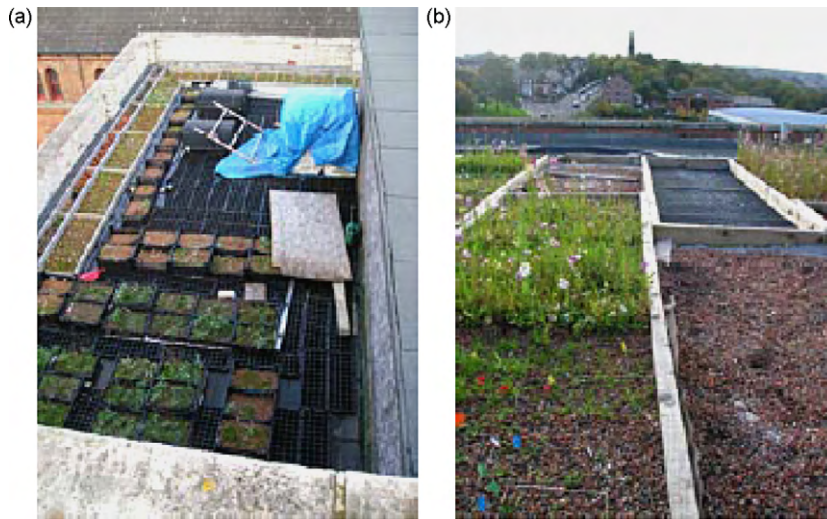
Trial beds on the Ryokka Project building laid on a) a concrete slab roof, and b) a steel framed roof.
